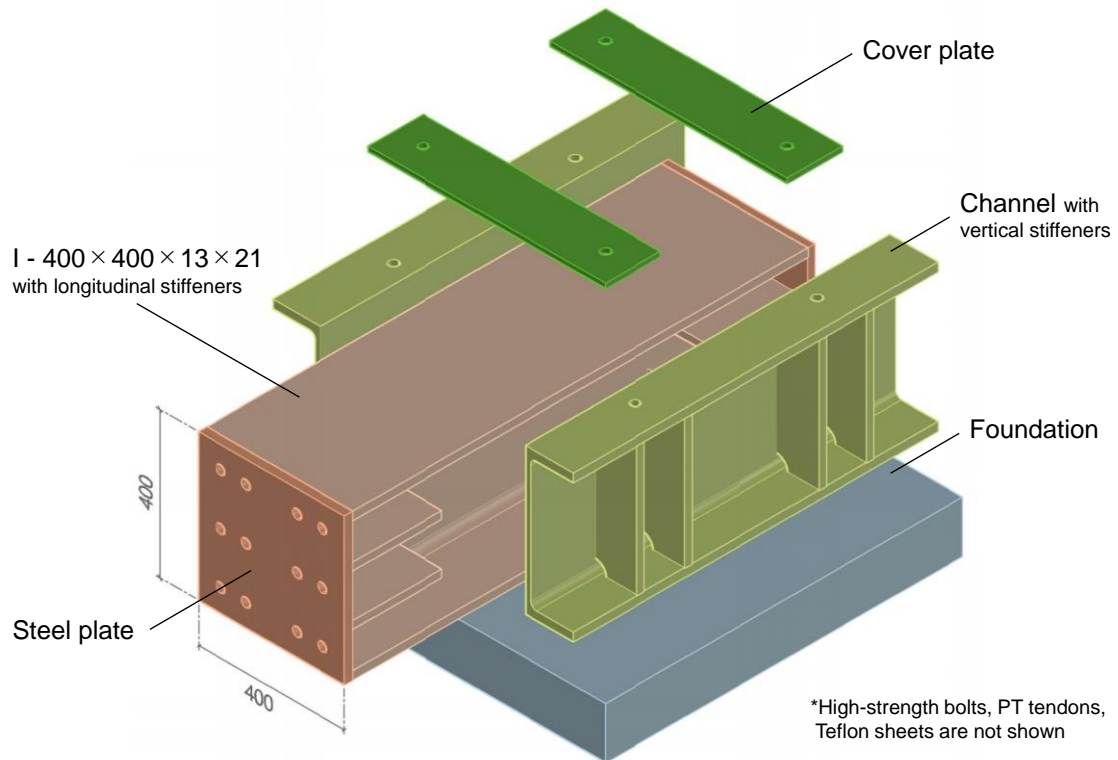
Loading setup: example of IHCB-F40 (Unit: mm)
